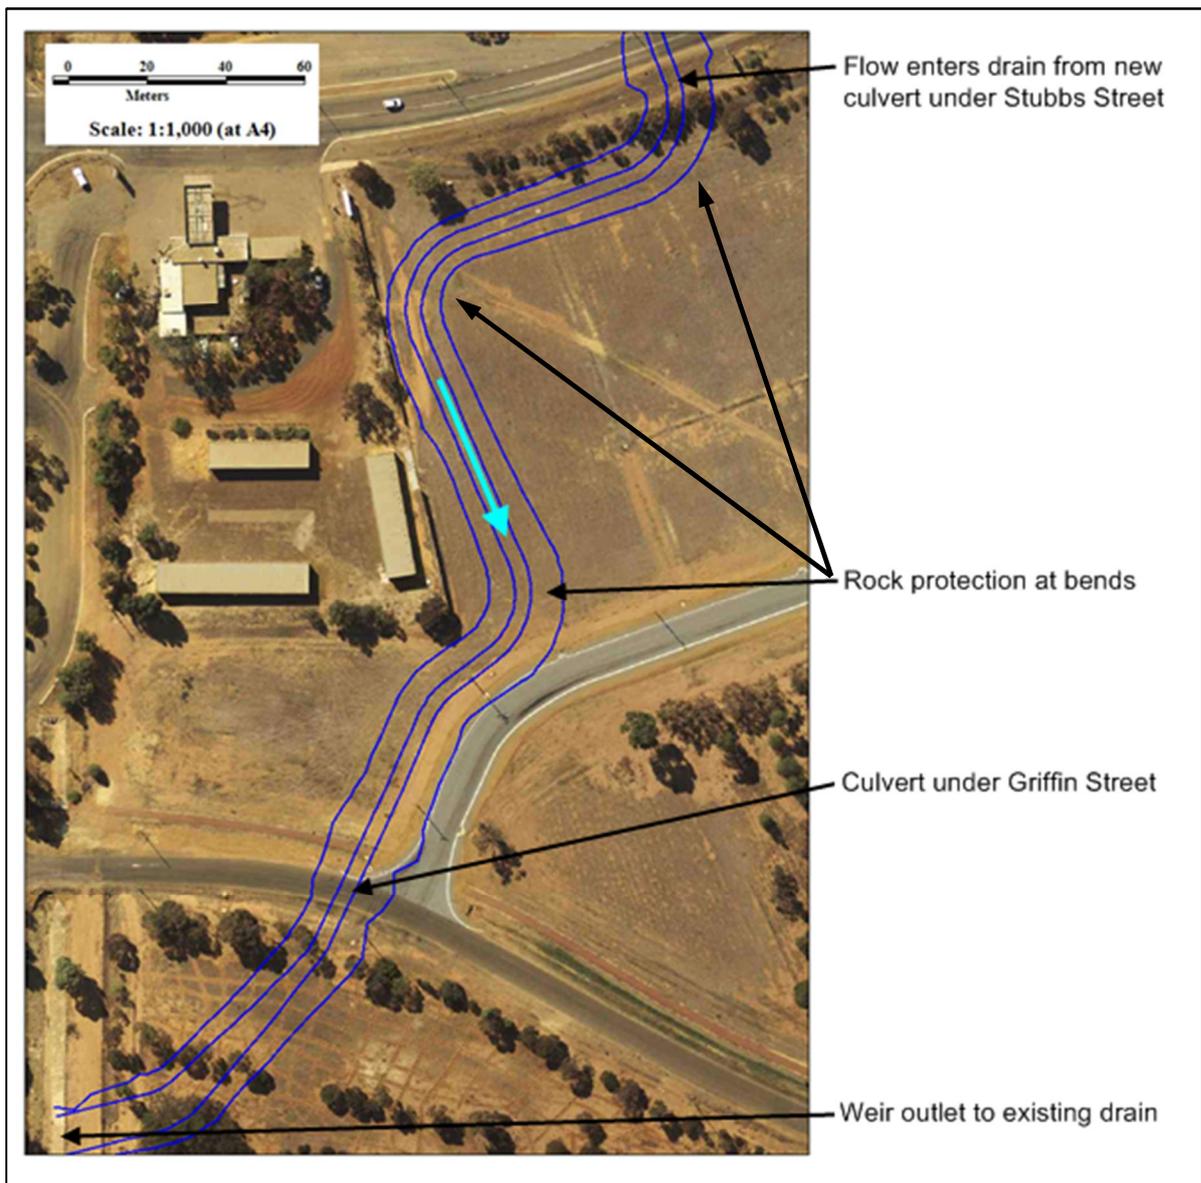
Stage 1: concept view of diversion drain (adjacent to Stubbs Street)
